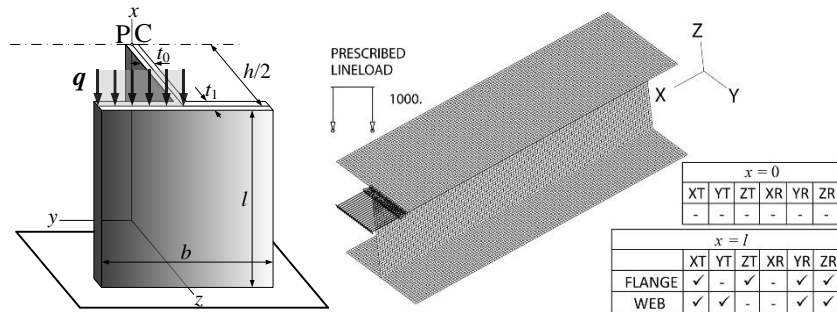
Column loading, half of cross-section (left); FEM model (right)
